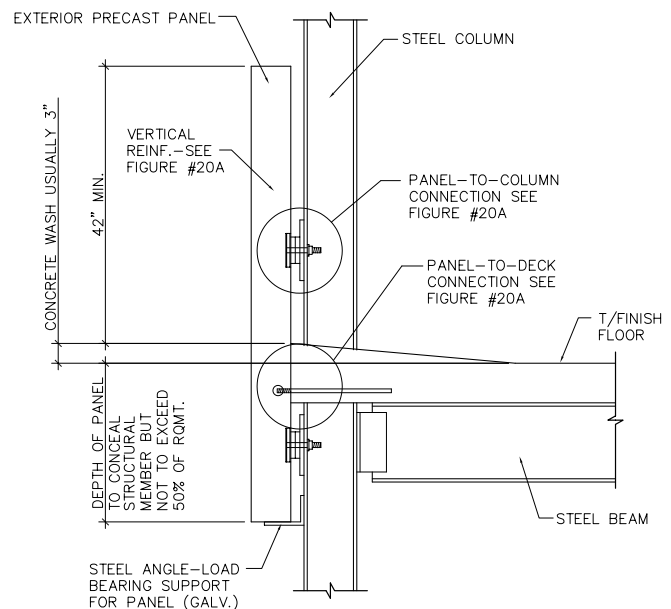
Typical Precast Panel to Steel Column Connection
